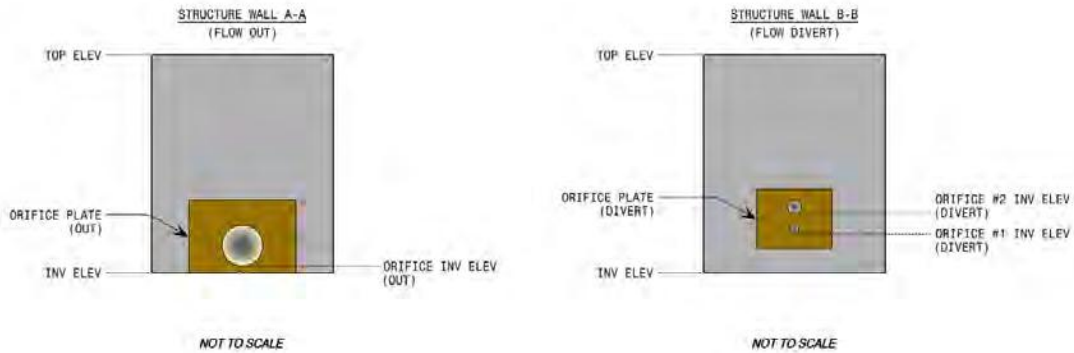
Stormdrain Diversion Structure Concept: Section Views for WDS # 1
